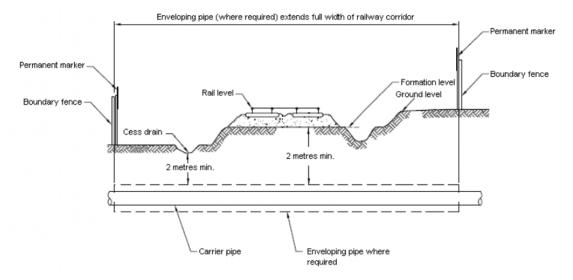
Cross-section Showing Service Pipe Under the Railway Corridor Installation by pipe jacking / tunnel boring / micro-tunnelling / pipe ramming
